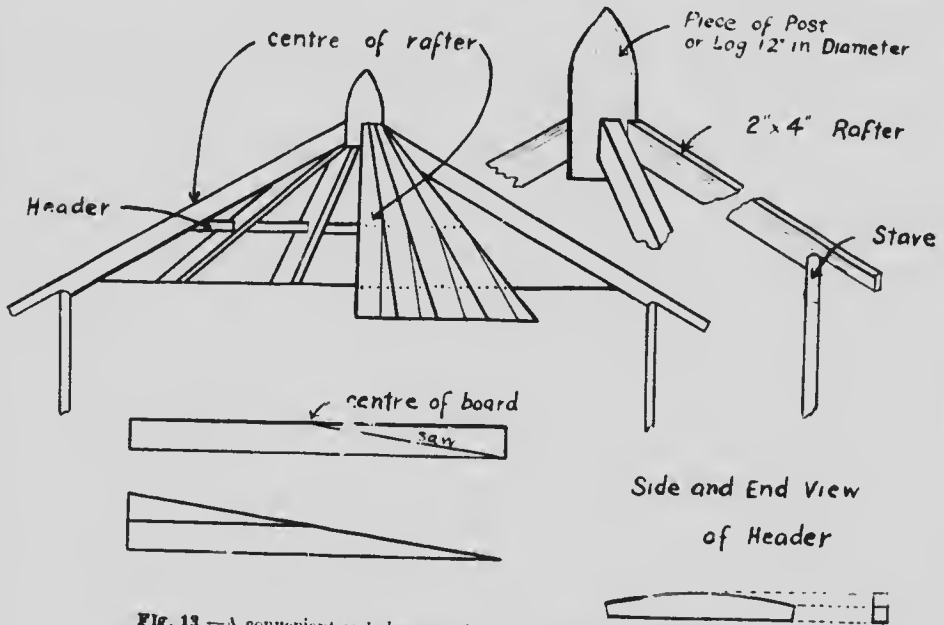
A convenient and cheap method of building a roof on a stave silo.
